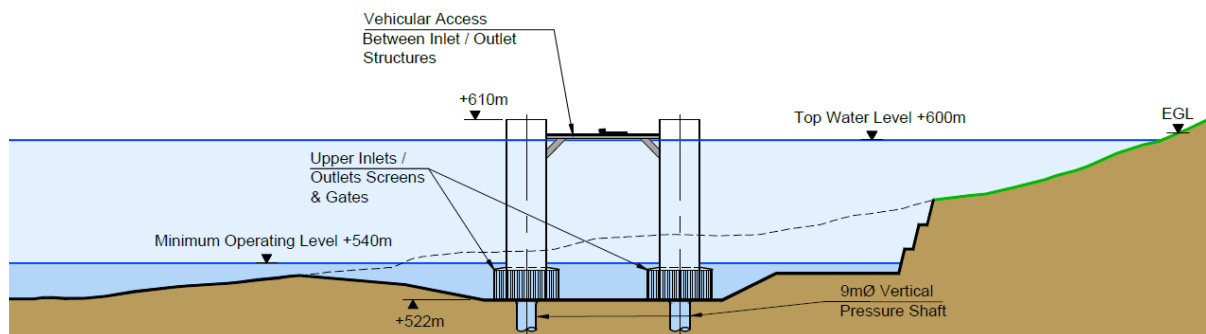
Upper Control Works Arrangement (extract from Figure 2.7)
